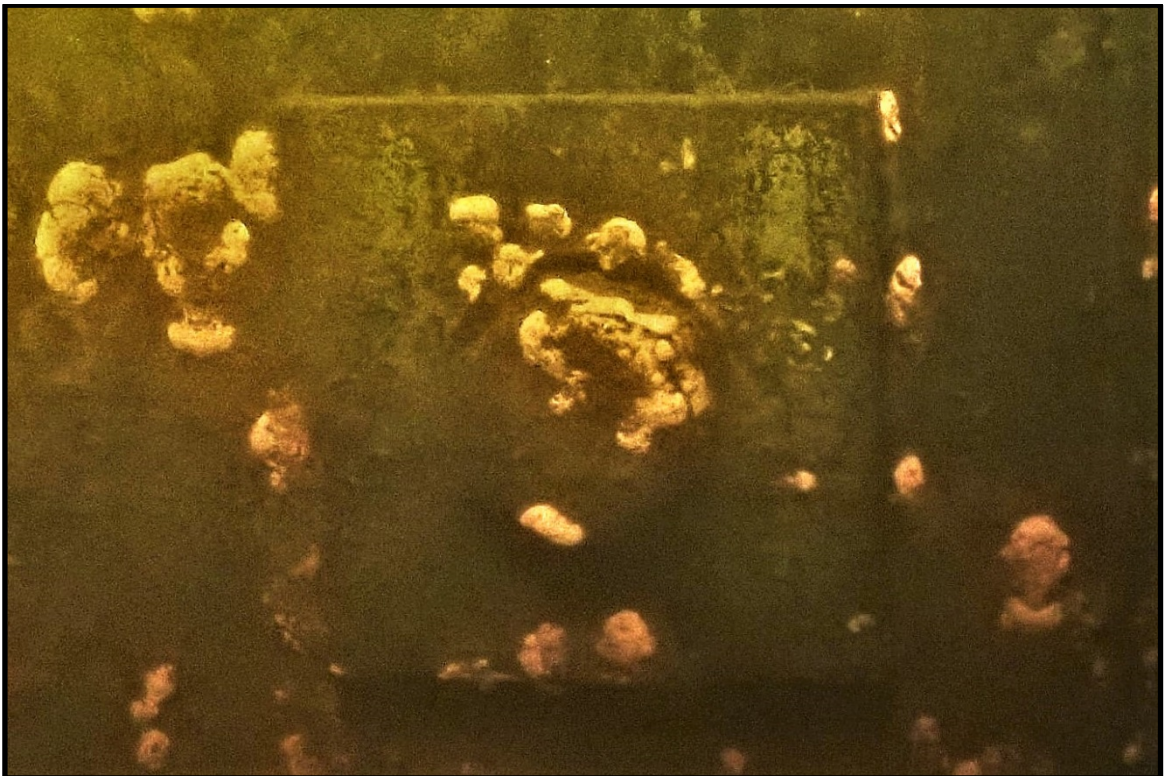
Underwater view of typical water connection bolts and washer plate.
